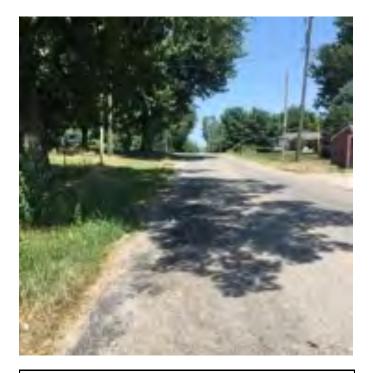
Facing north — view of CR 29 north of U.S. 20.
